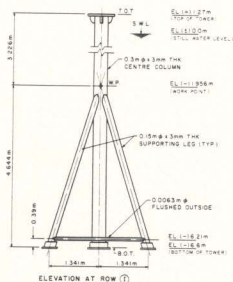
The fabrication drawing describing the side elevation of the tower
